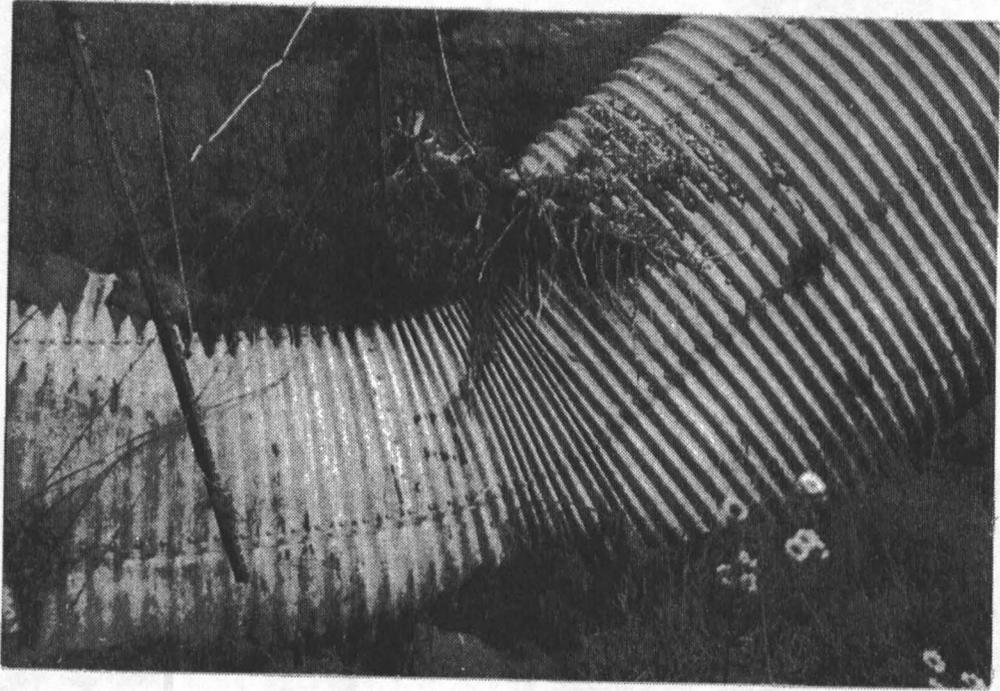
View from the centerline of road showing 120" diameter pipe, about 300 feet long after failure. (Photograph from Darrel Coy, Iowa DOT)
